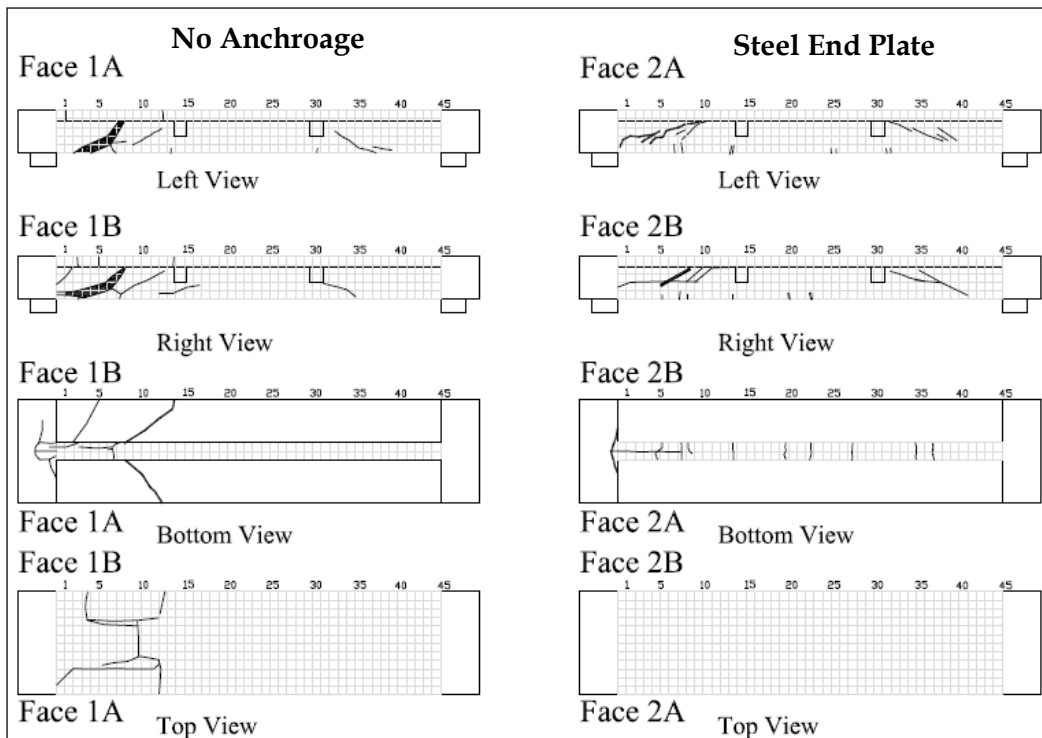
Crack Patterns in the First Two 1T1S Specimens with and without End Anchorage
